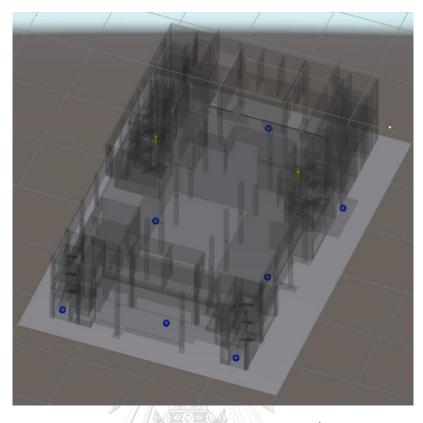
Fire extinguisher installation plan for 1st and 2nd floors of scenario 2D
